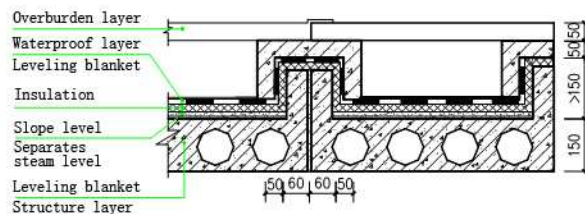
The reinforced concrete prefabricated groove plate flat roof structure
